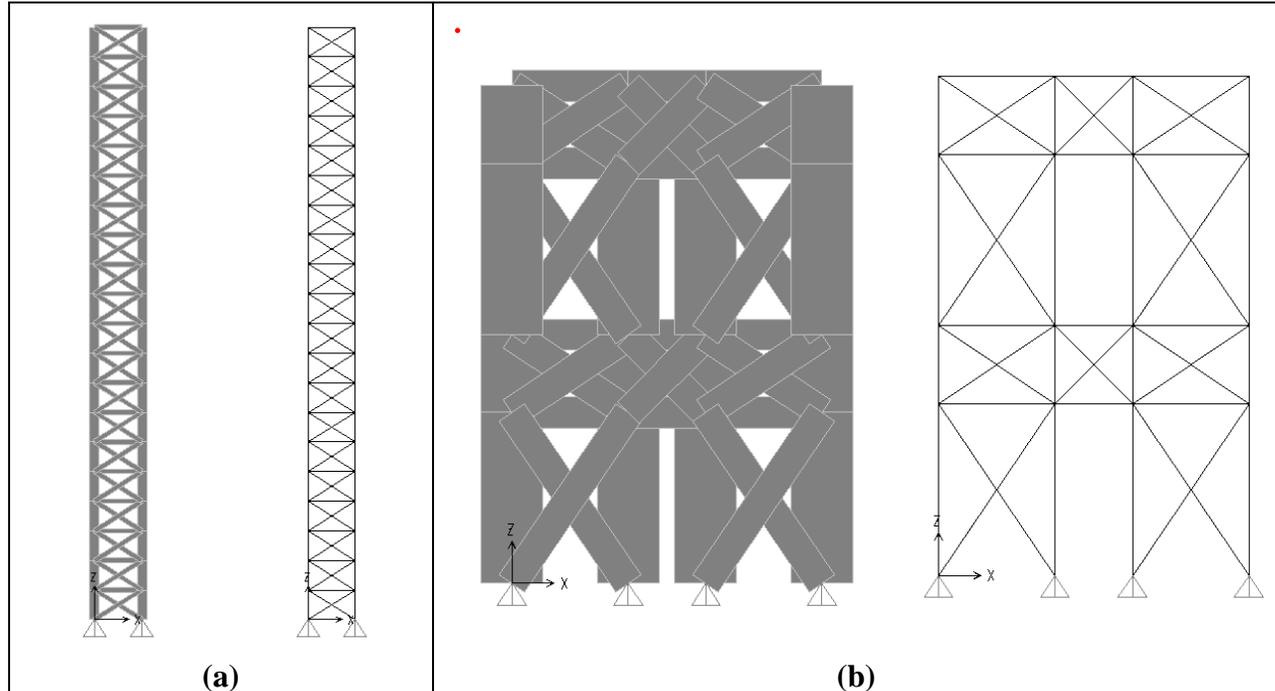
(a) Strut and tie model of planner wall; (b) Strut and tie model of core wall with opening
